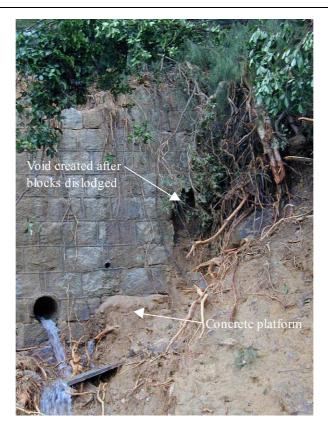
View Showing Northern End of the Masonry Toe Wall and Location from Where Masonry Blocks have been Dislodged (Photograph Taken on 24 August 2000)
